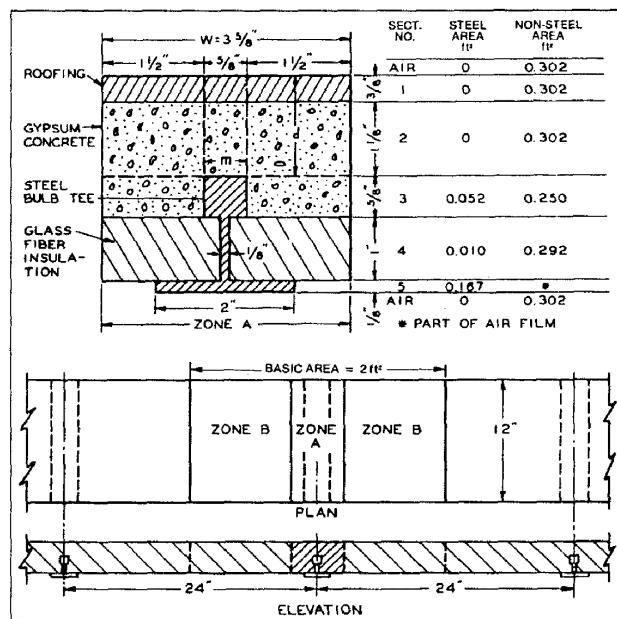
Gypsum Roof Deck on Bulb Tees (Example 4)
